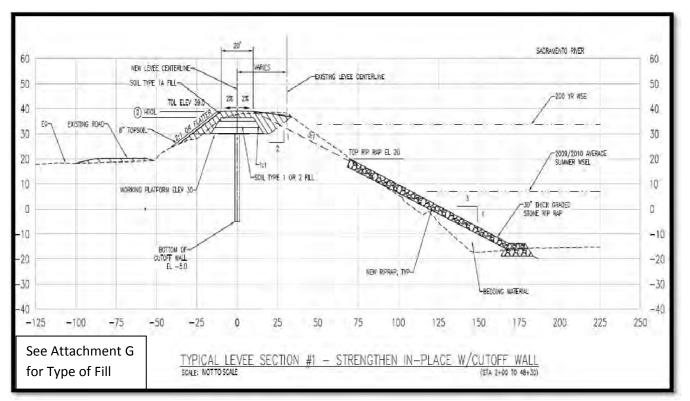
Typical Cross Section Strengthen In-Place with Cutoff wall
